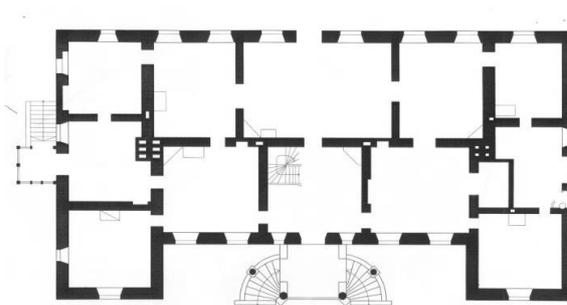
Liepupe Manor House. First floor plan. 1949.
